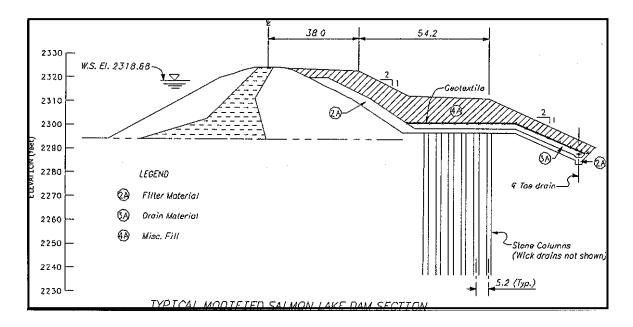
Typical cross section of the Salmon Lake Dam (Luehring et al, 1998).
